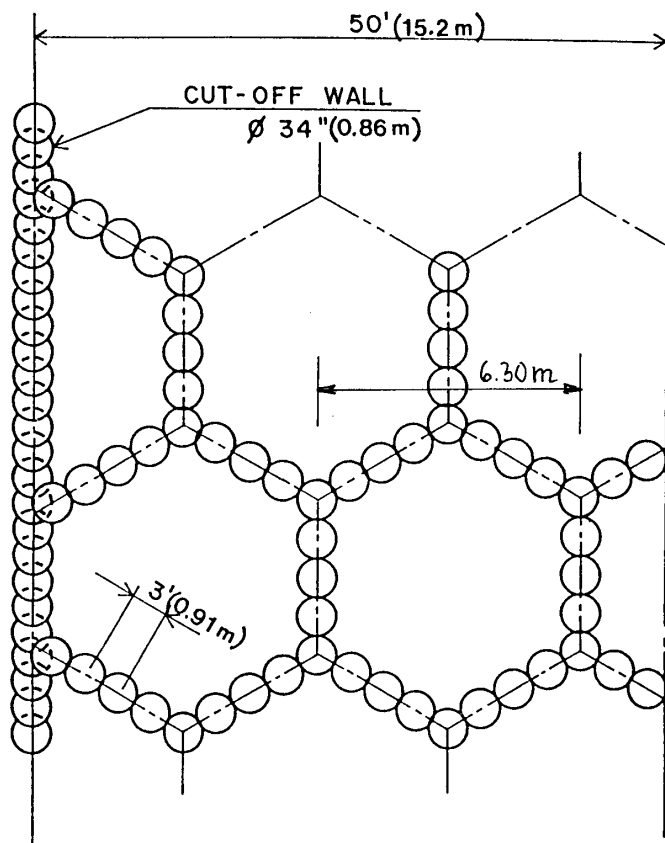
Jackson Lake Dam: Honey-comb grid of soil-cement columns for liquefaction stabilization (Ryan & Jasperse, 1989)
